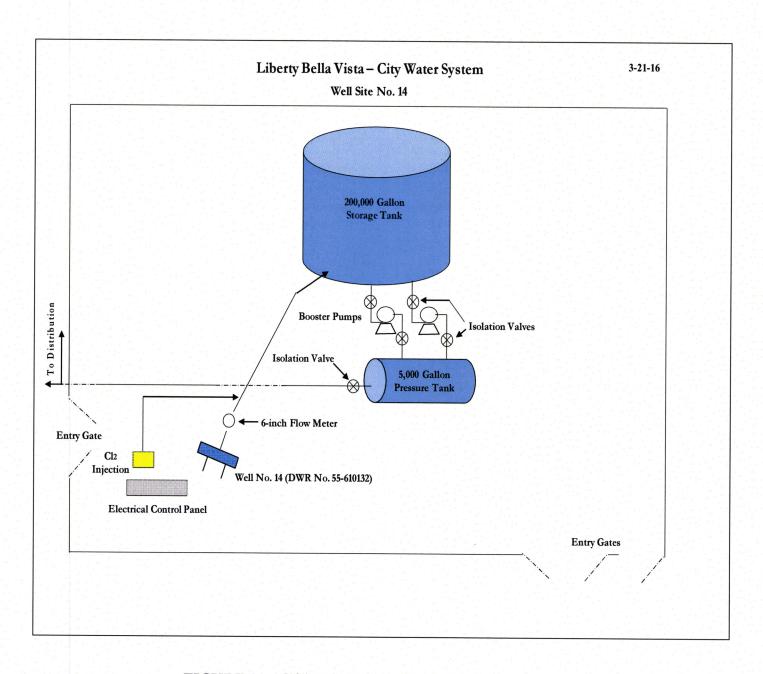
CITY WATER SYSTEM WELL SITE NO. 14
